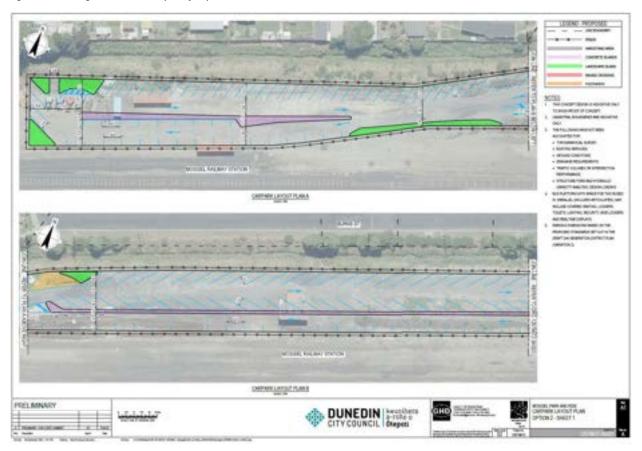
Mosgiel Park and Ride carpark layout plan sheet 2
